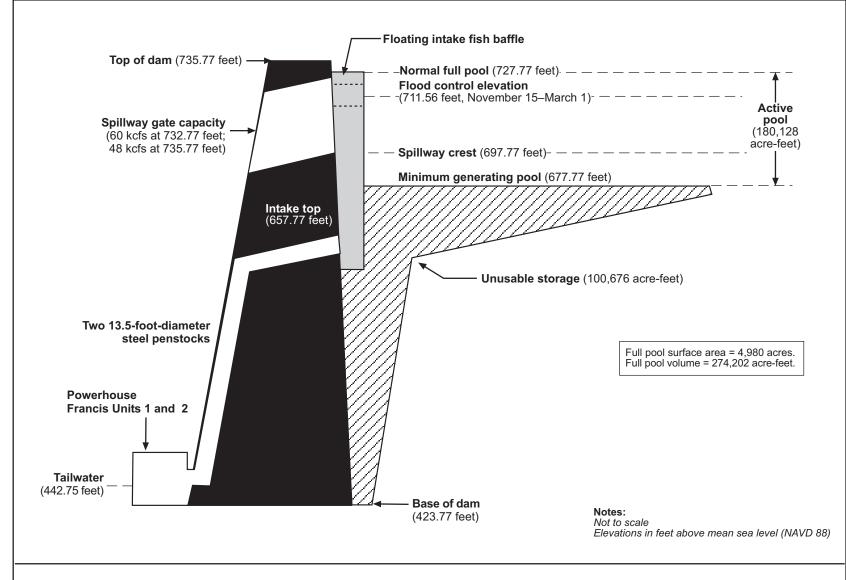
Upper Baker dam cross-section. (Source: Adapted from Puget)
